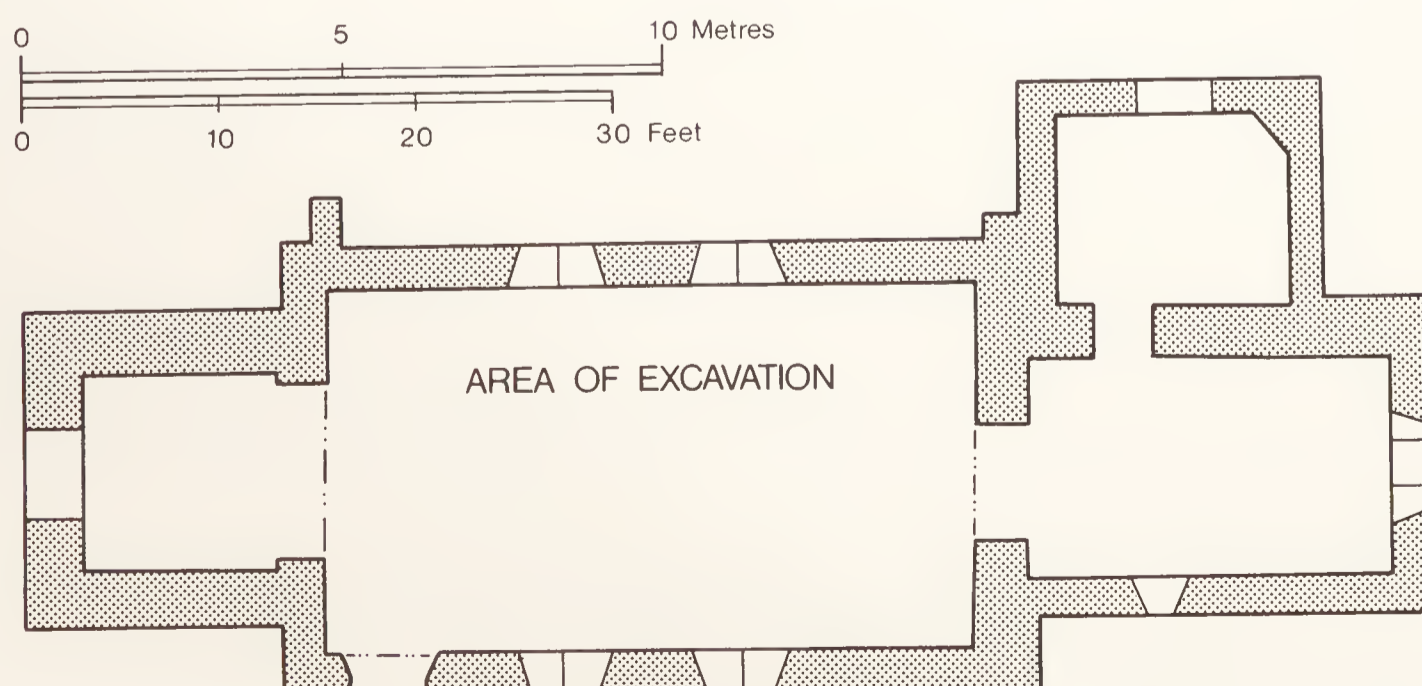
St. Mary's, Levisham: plan of the existing fabric
